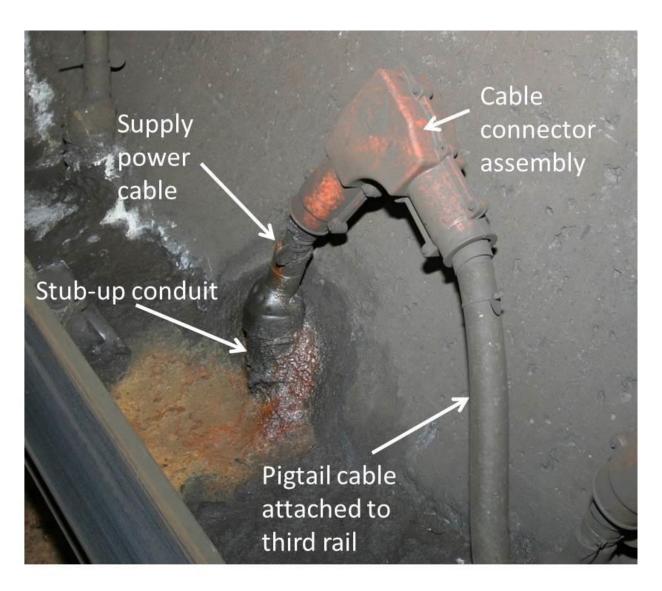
A typical stub-up conduit with supply power cable, cable connector assembly, and pigtail cable.
